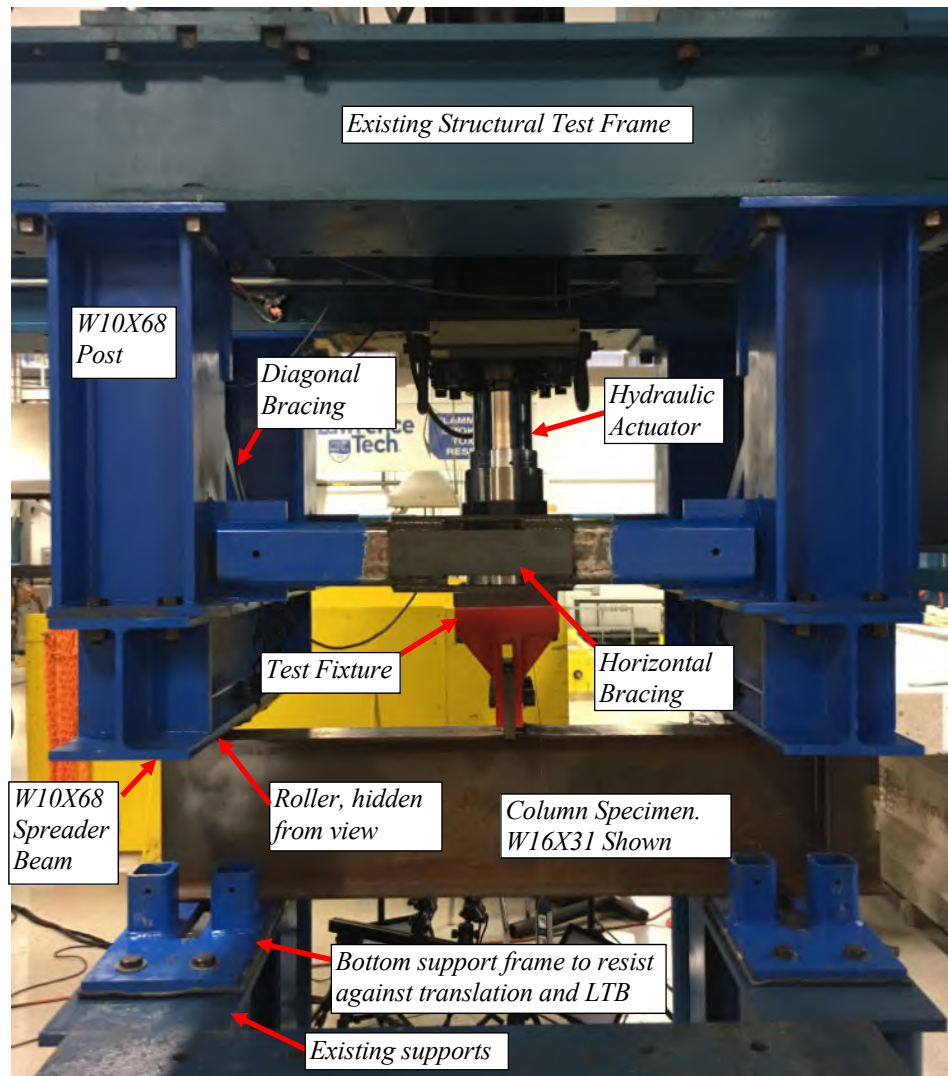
Side elevation of test setup at midspan emphasizing bottom support frame
